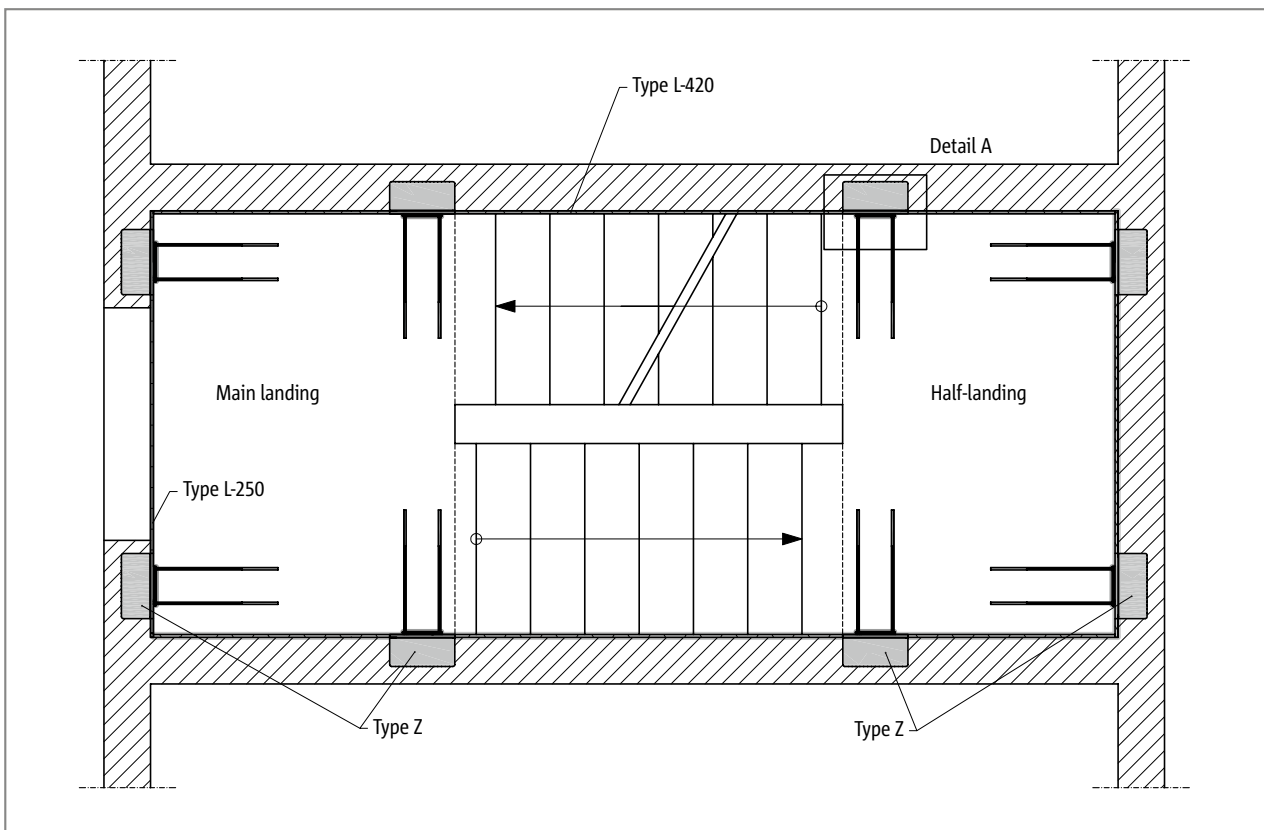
Schöck Tronsole® type Z: Alternative element configuration in plan view
